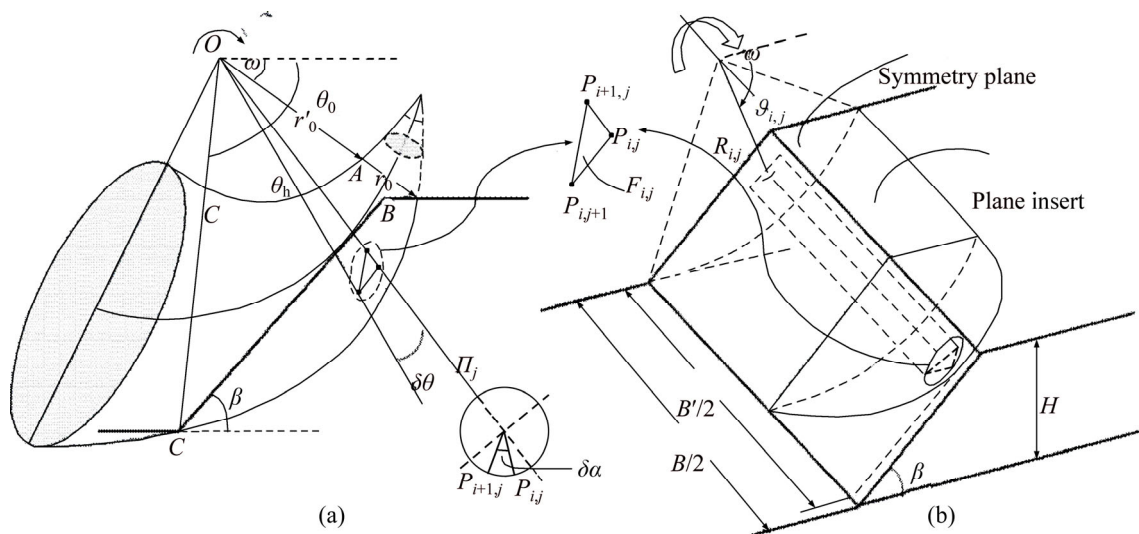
3D Horn failure mechanism of a slope: (a) 2D view; (b) 3D view
